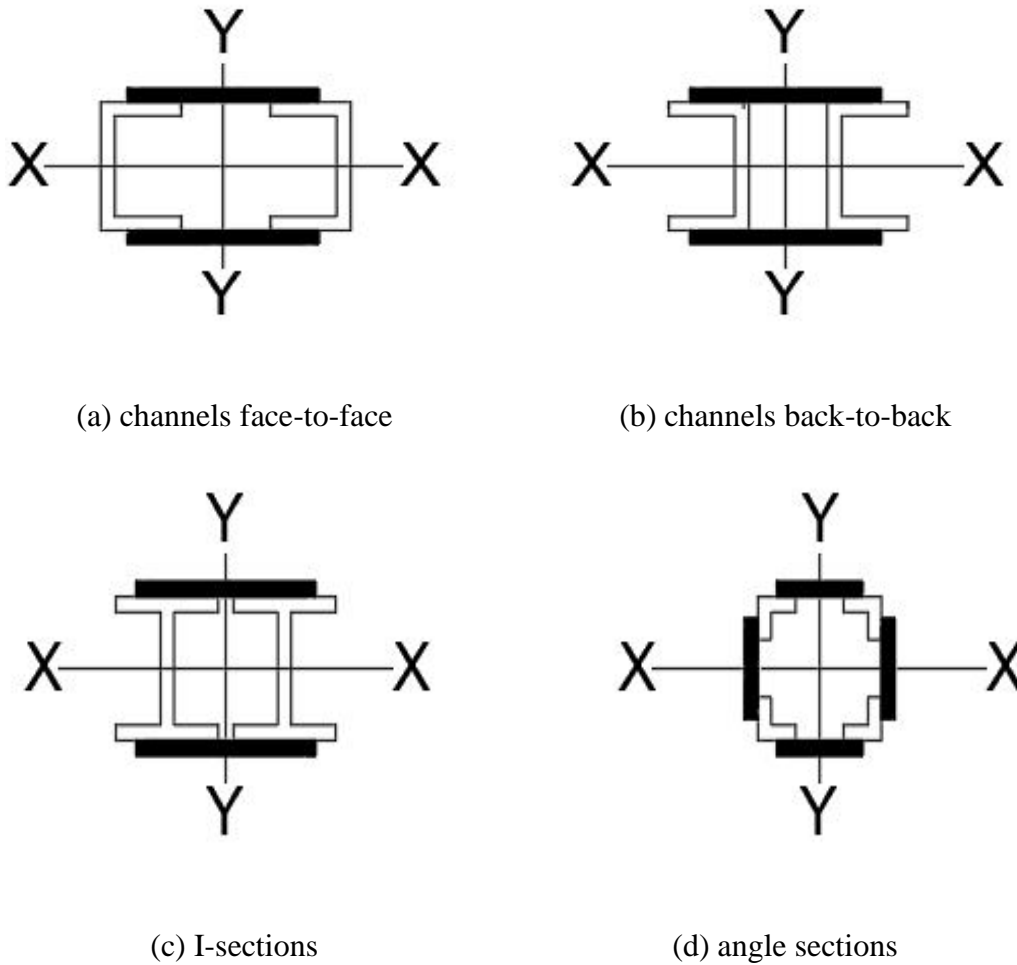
Types of built-up sections (a) channels face-to-face (b) channels back-to-back (c) I-sections (d) angle section (continue)
